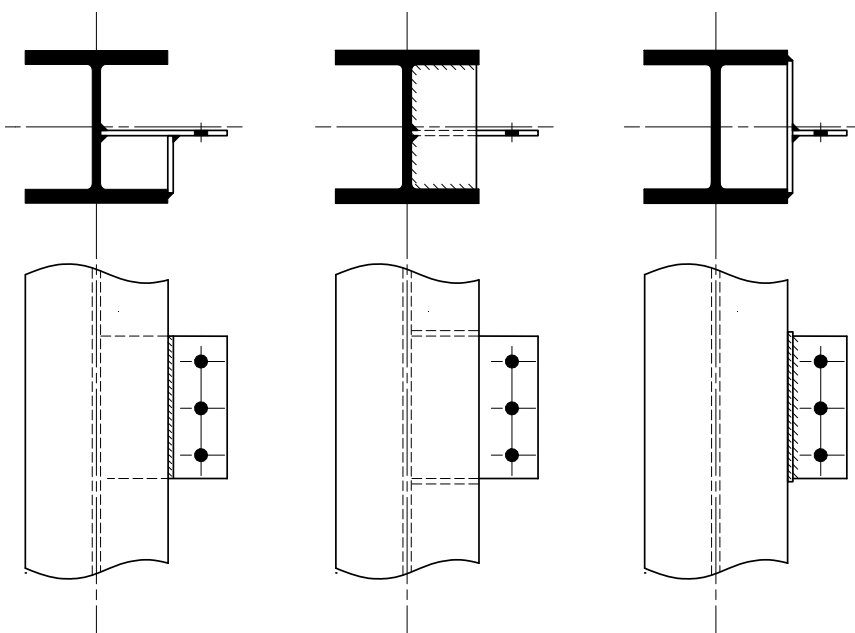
Stiffening arrangements for long fin plates to column webs
